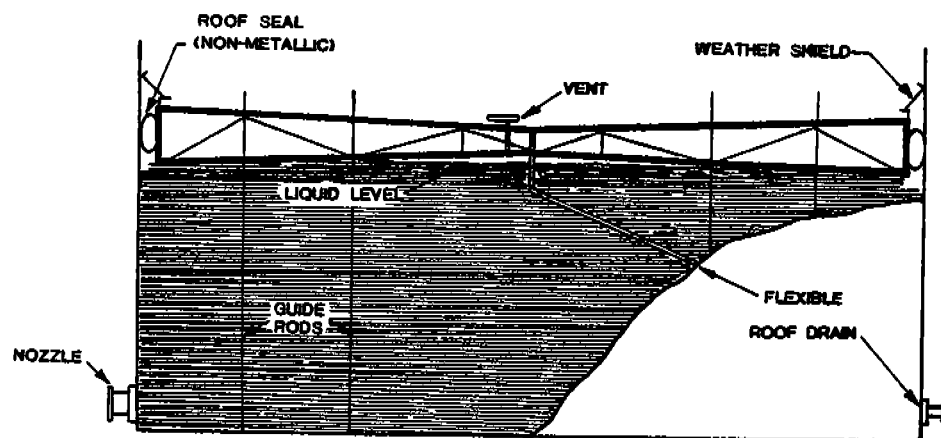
Double deck floating roof storage tank with non-metallic seals.
